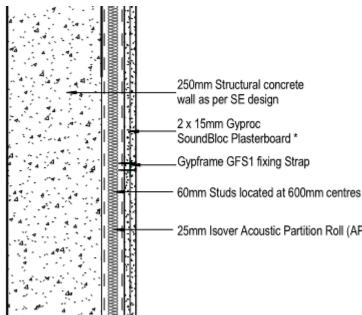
Proposed lining to lift shafts and MEP risers adjacent to apartments
